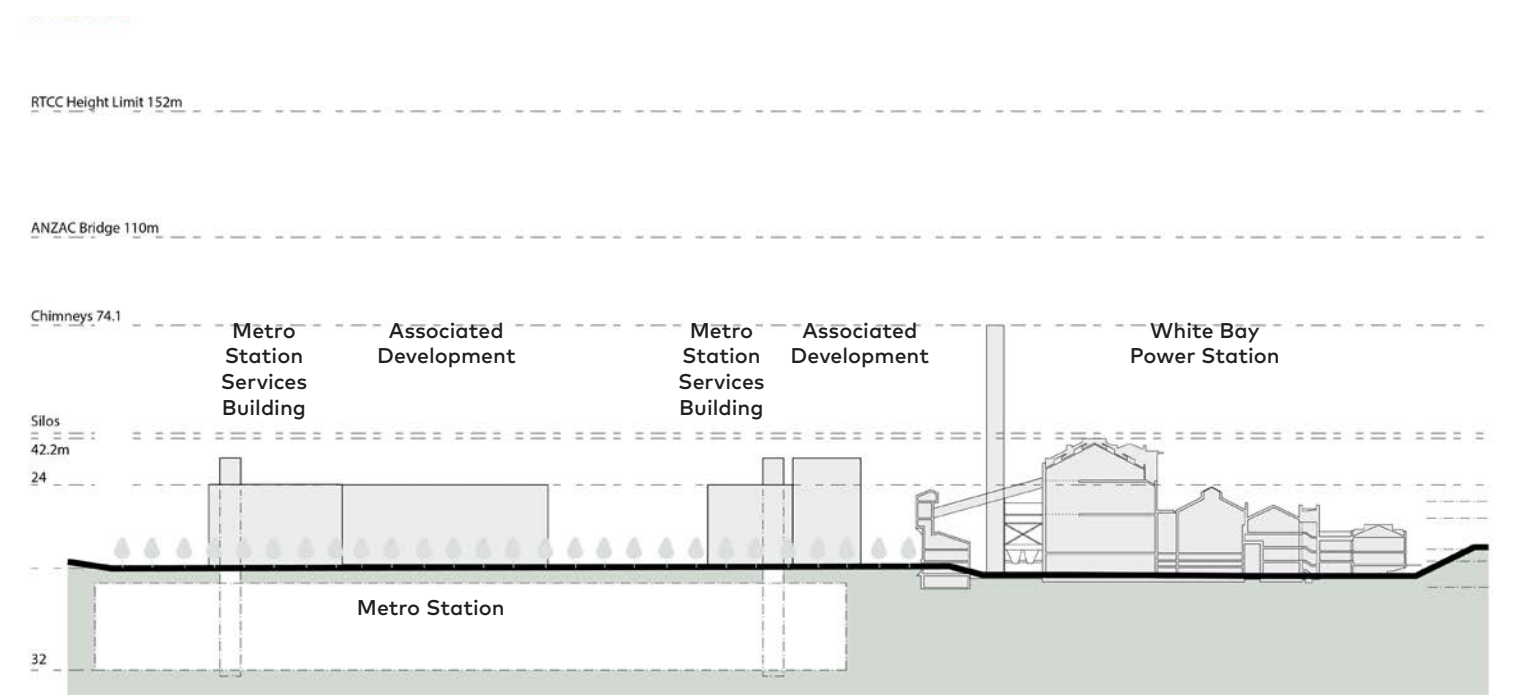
White Bay Power Station (and Metro) Sub-precinct section showing future Metro station and associated servicing
